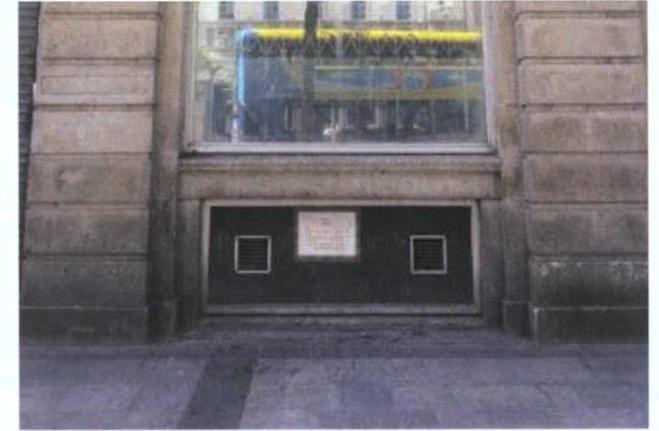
Late 20th century insert in stall riser, framed in granite. Panel to be replaced. All masonry elements to be retained and gently cleaned down.
